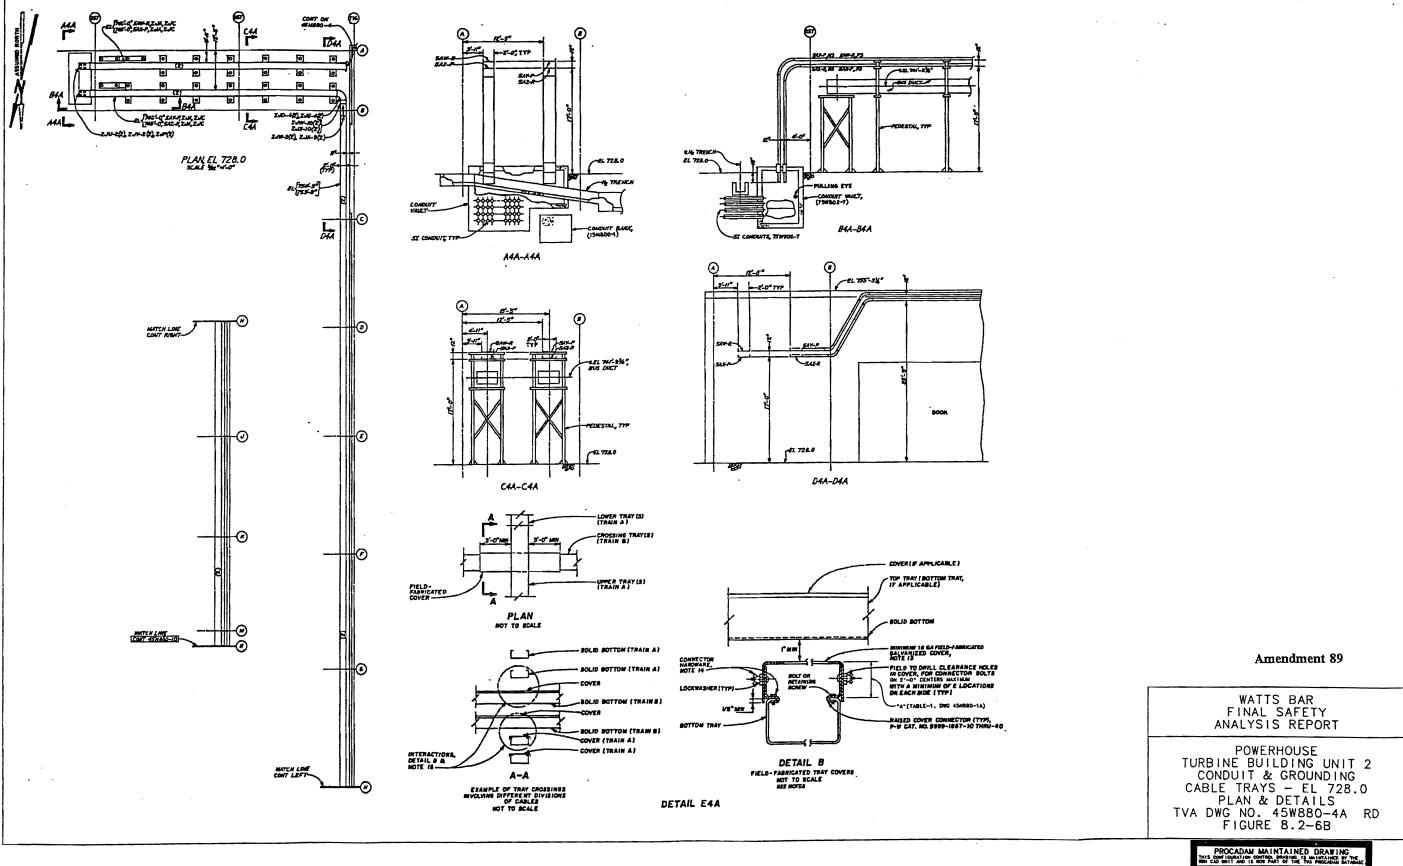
Powerhouse Turbine Building - Unit 2 Conduit and Grounding Cable Trays -EL. 728.0 Plan and Details
